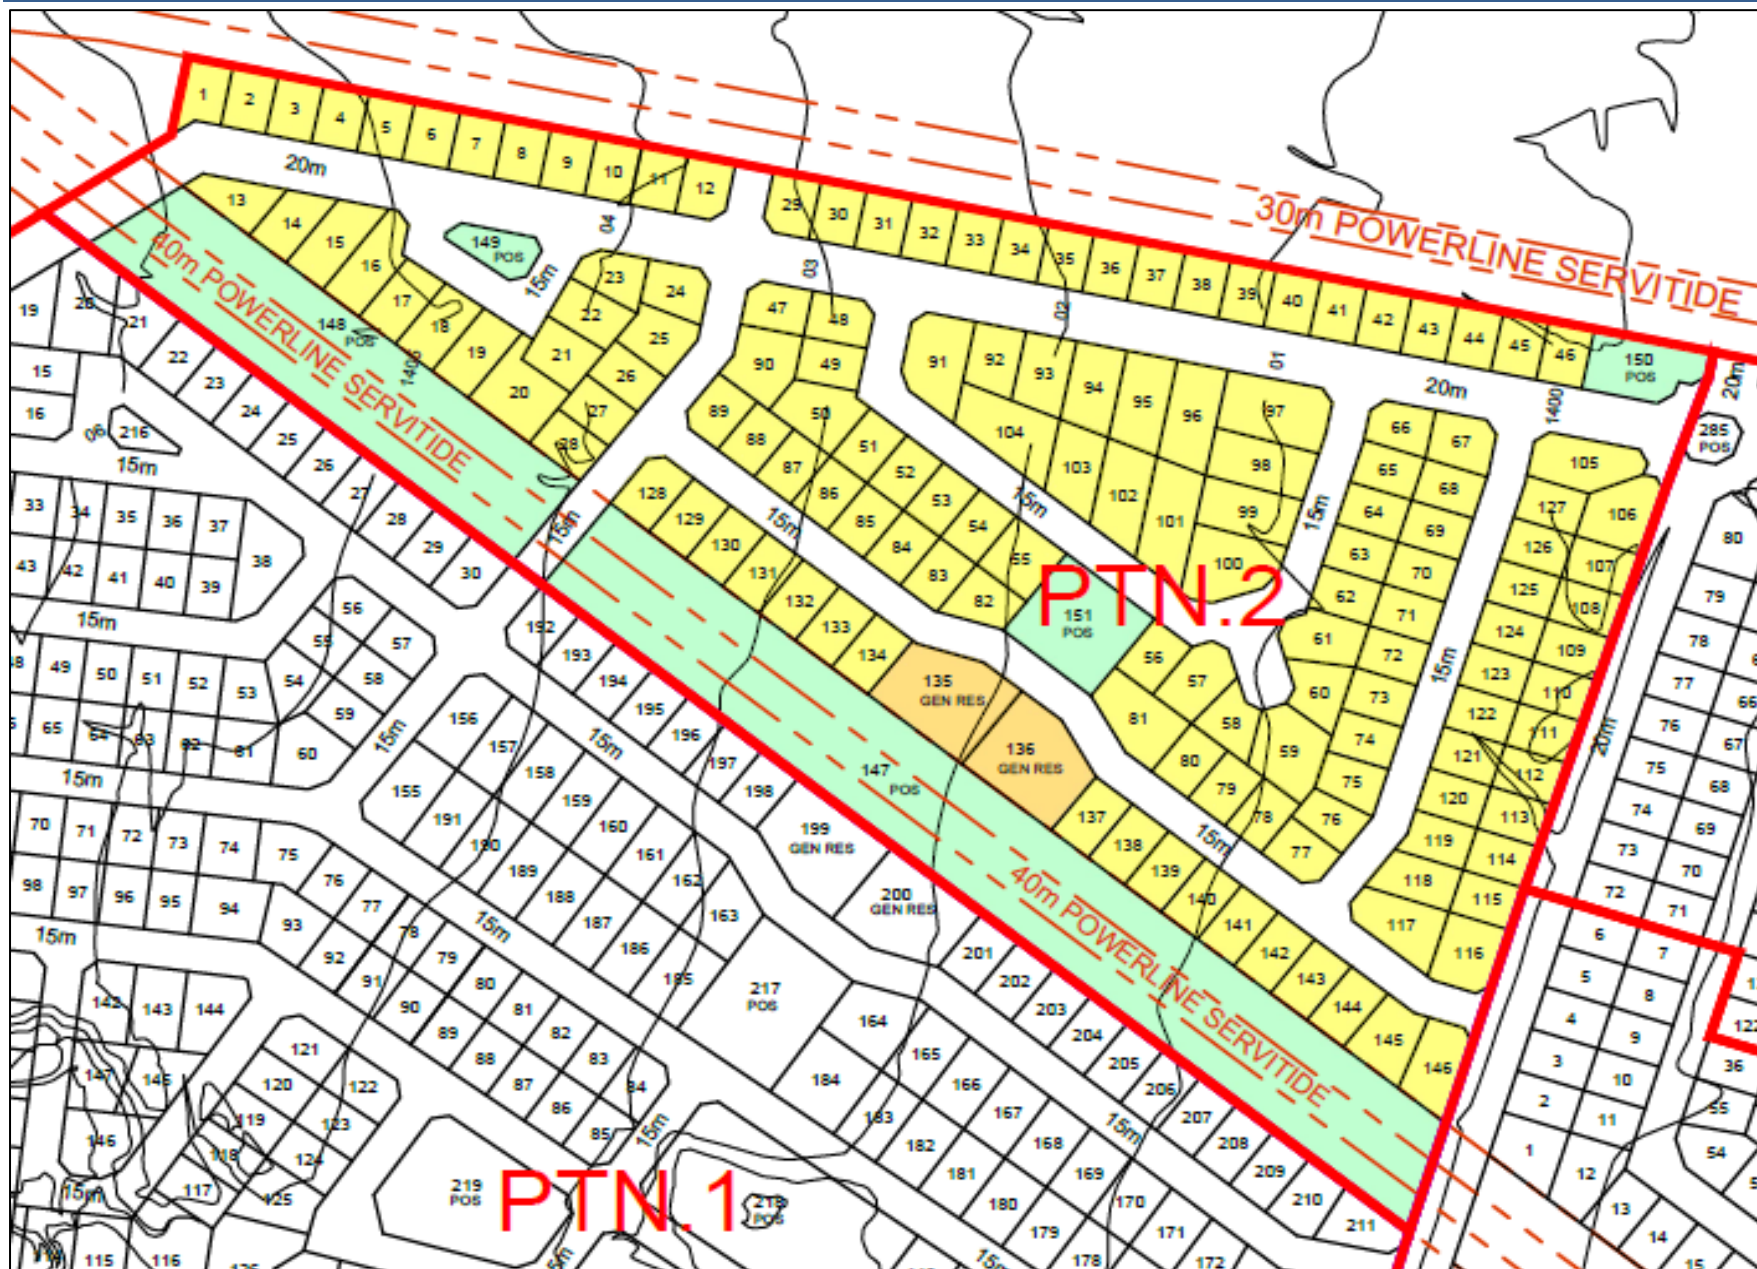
Proposed Layout Plan of Rehoboth Portion 1
